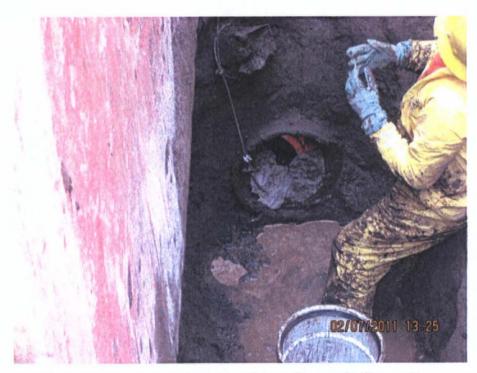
Placement of seal in 12-inch Pipe at CMP transition. Photo taken looking west.
